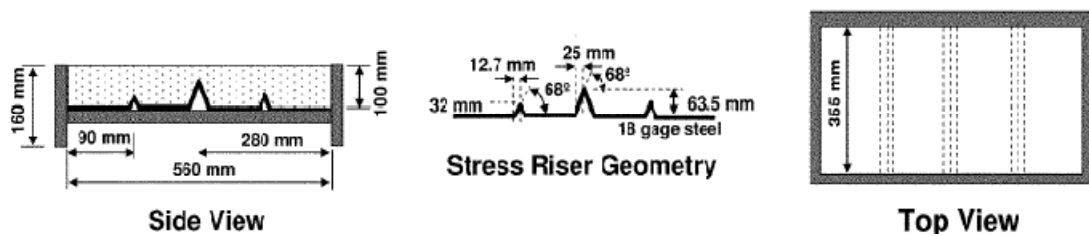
Geometry of slab forms for plastic shrinkage cracking test (*Lura et al. 2007*)
